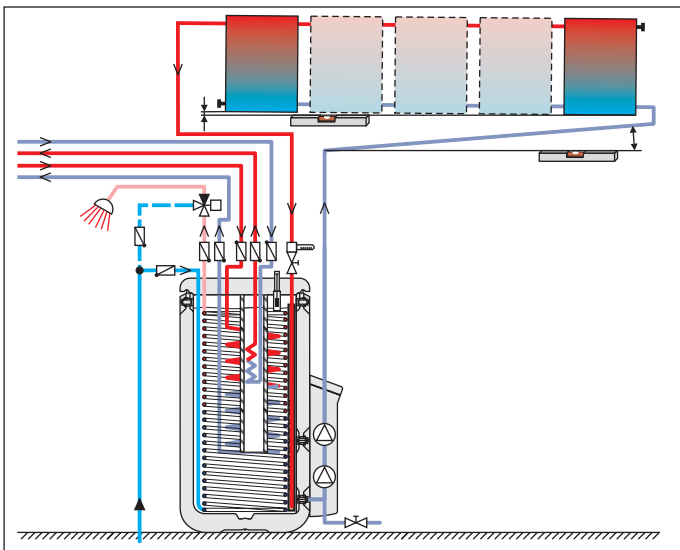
Solar panel array connected at opposite ends with hot water storage tank EKHP* ⁽¹⁾type of connection recommended by DAIKIN)
